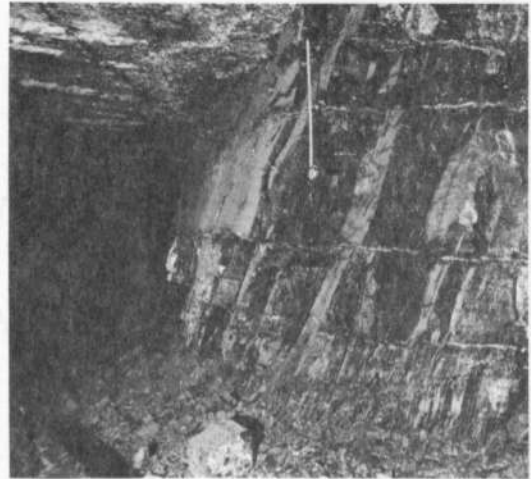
View of unsheared and non outburst-prone coal in 53 west-panel, showing face cleat planes. Steel tape is extended 1 m.
